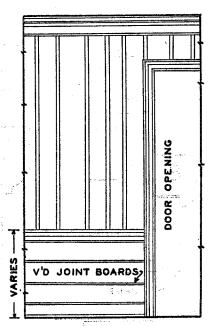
Horizontal paneling to chair rail, vertical above.
